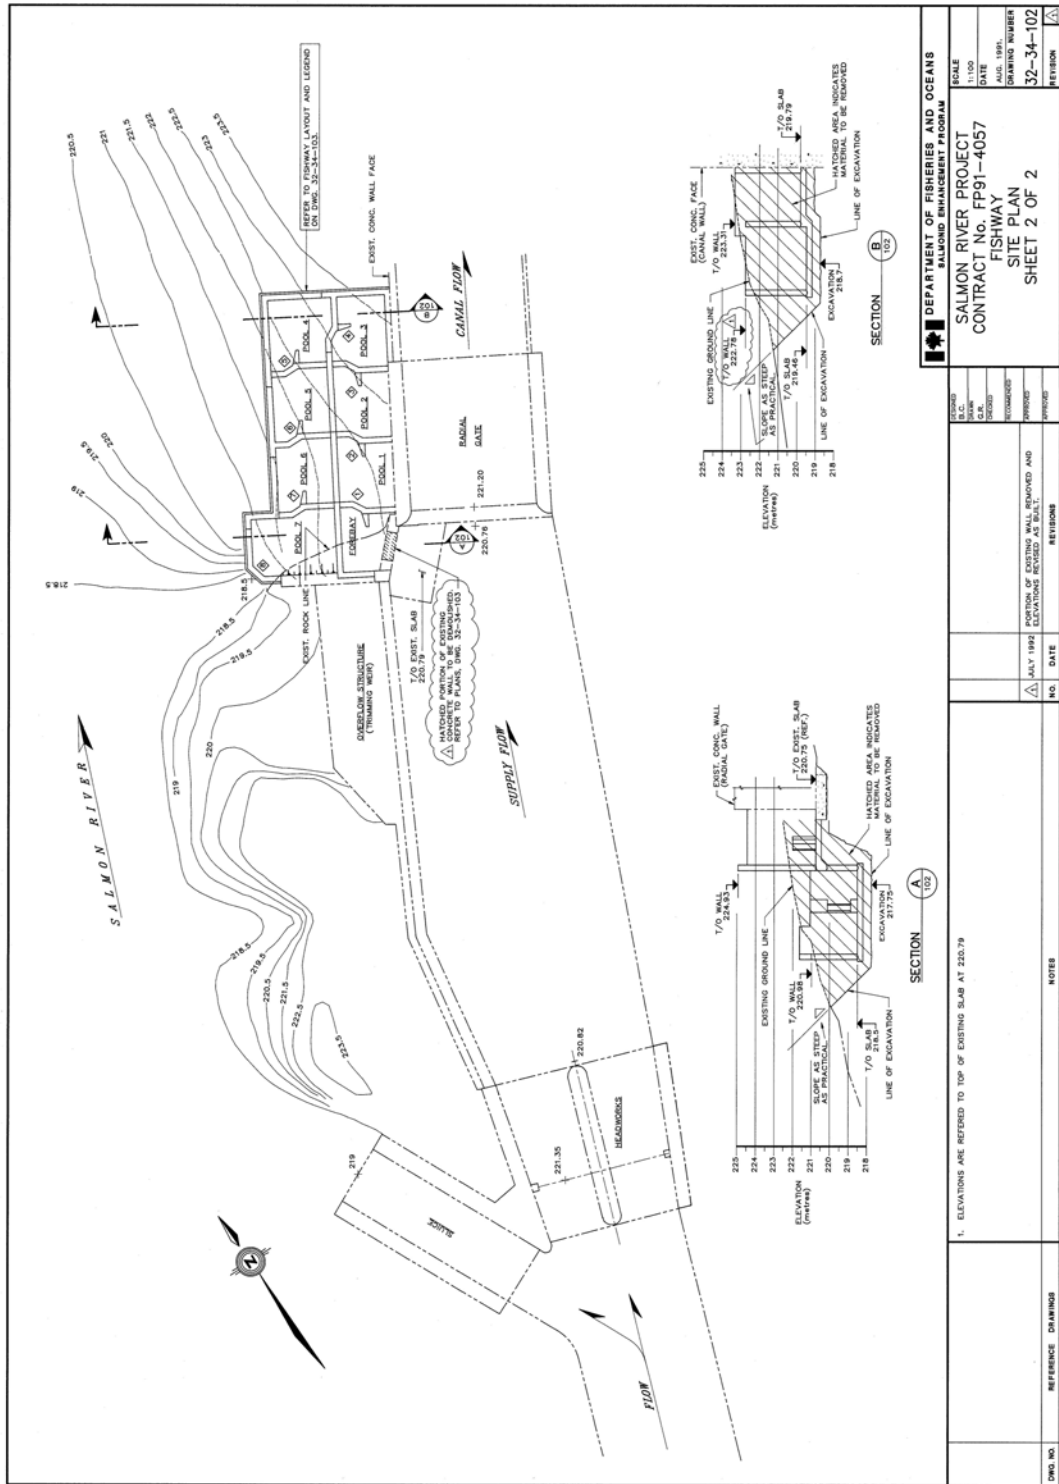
Fisheries & Oceans Canada (DFO) Fishway design site plan view with sections, showing steps and total elevation change, river to canal, canal wall is 4m above top cell entrance
